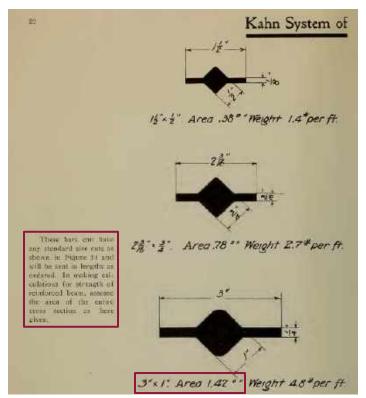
Excerpt from "Kahn System of Reinforced Concrete" manual dated 1904 providing which provides guidance on the calculation of effective reinforcing steel in reinforced concrete flexural members.
